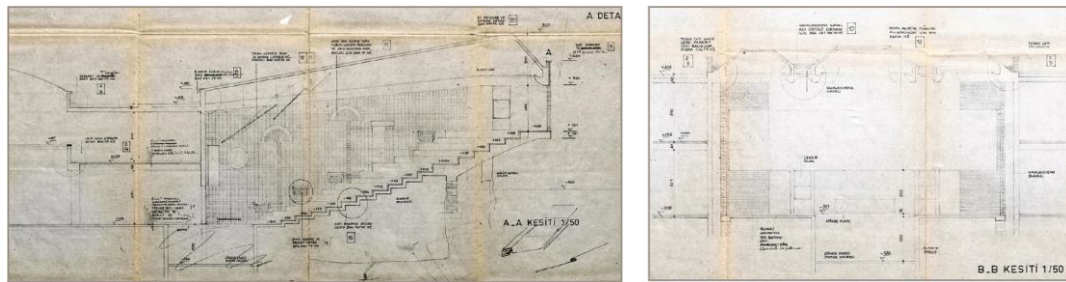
Original section drawing of the lecture hall³⁰⁵
